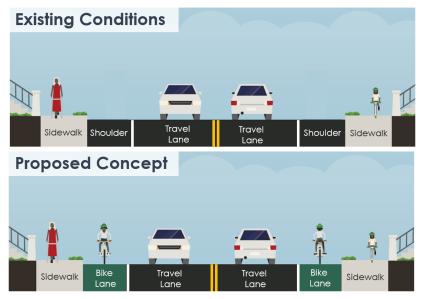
Shoulders to Bike Lanes on Courthouse Road
